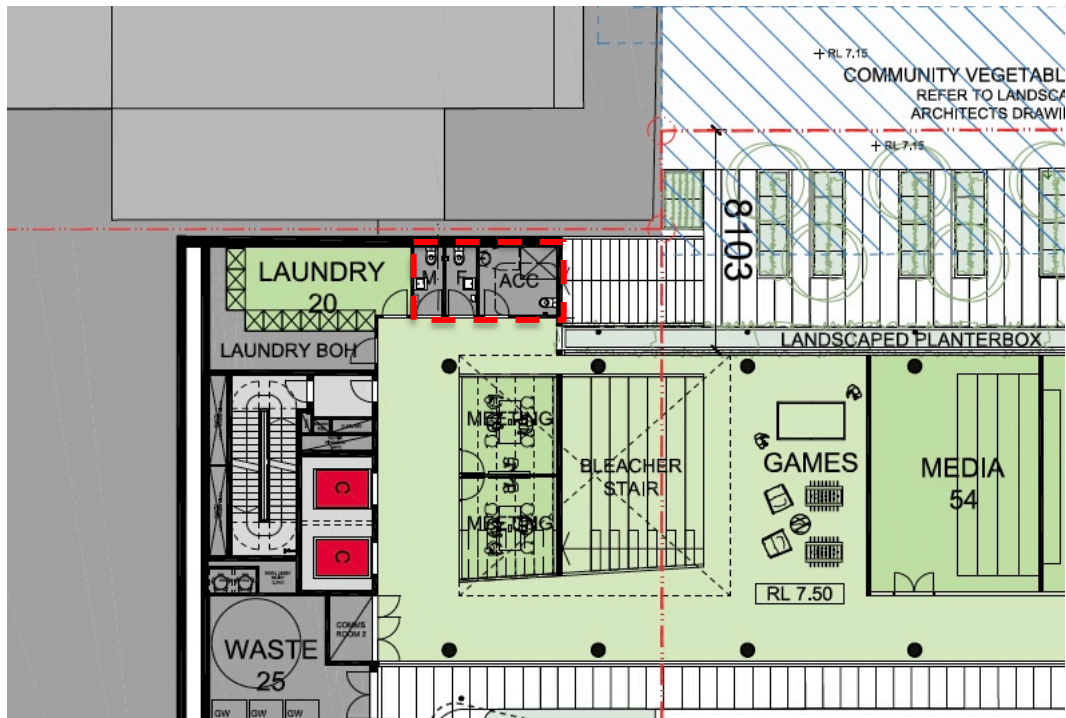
WC facilities provided on Lower Ground Level (DA03.0G1, Rev B)
